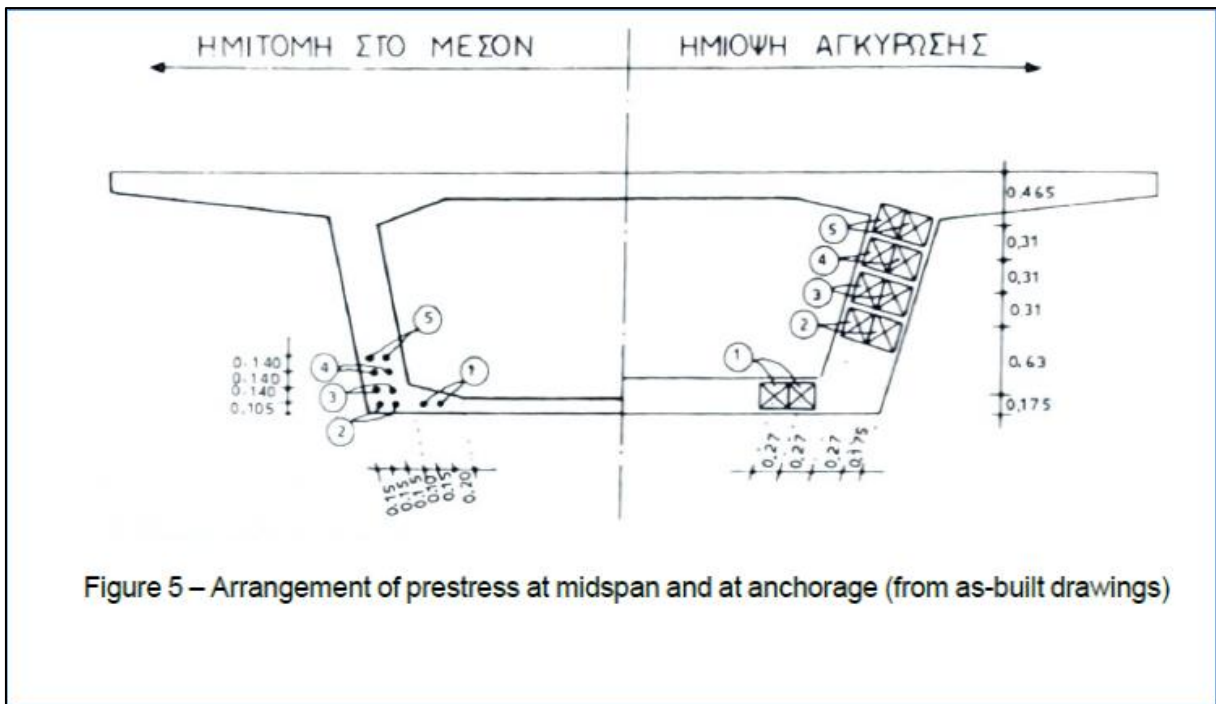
Arrangement of prestress at midspan and at anchorage (from as-built drawings)
